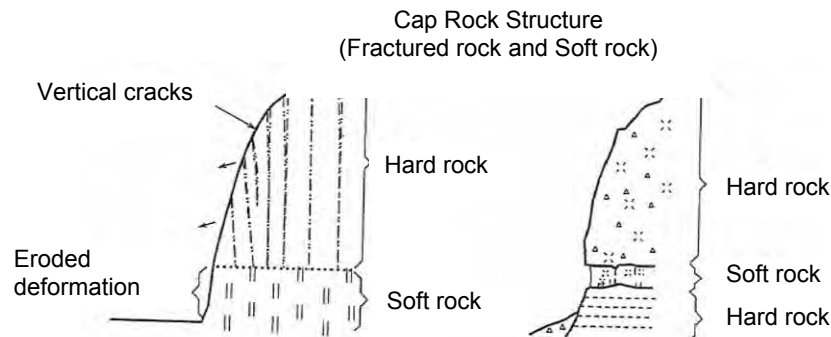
Example of Cap Rock Structure (Source: Road Management Technical Center^{*4})
